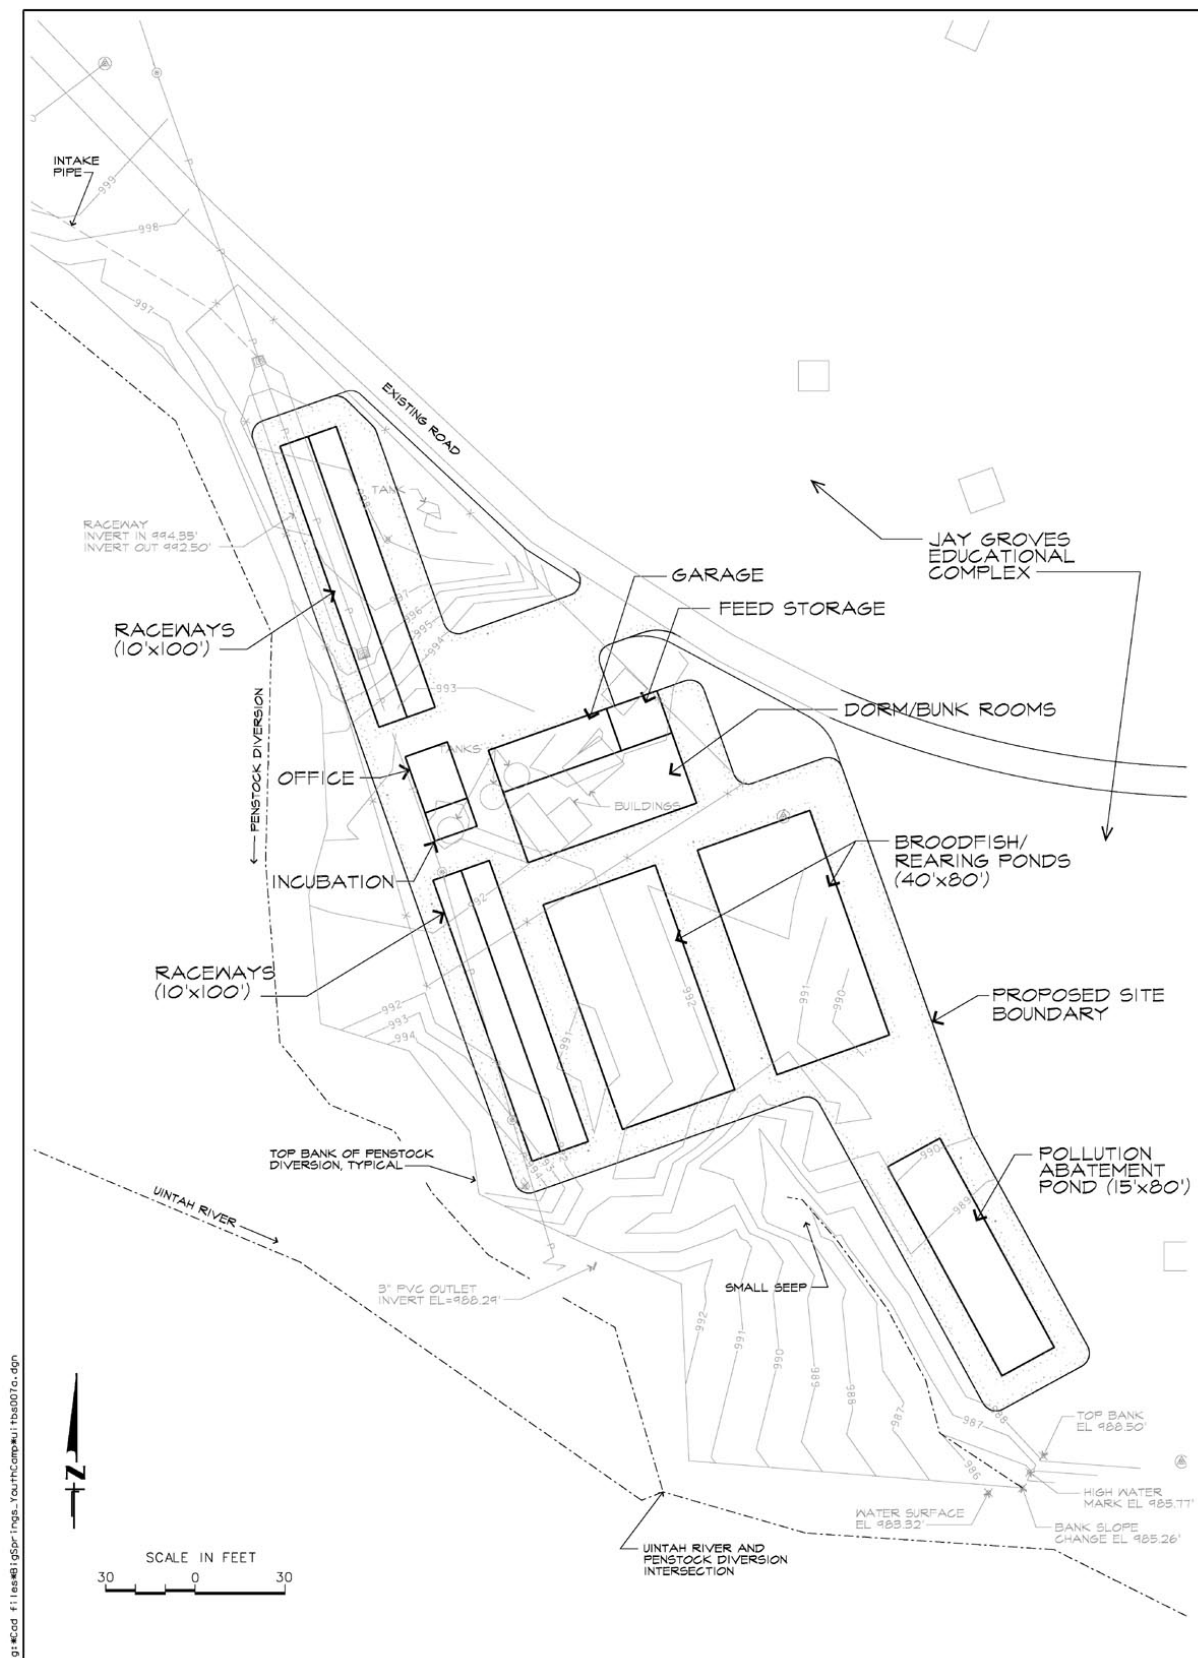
Youth Camp Unit existing site plan and proposed expansion.
